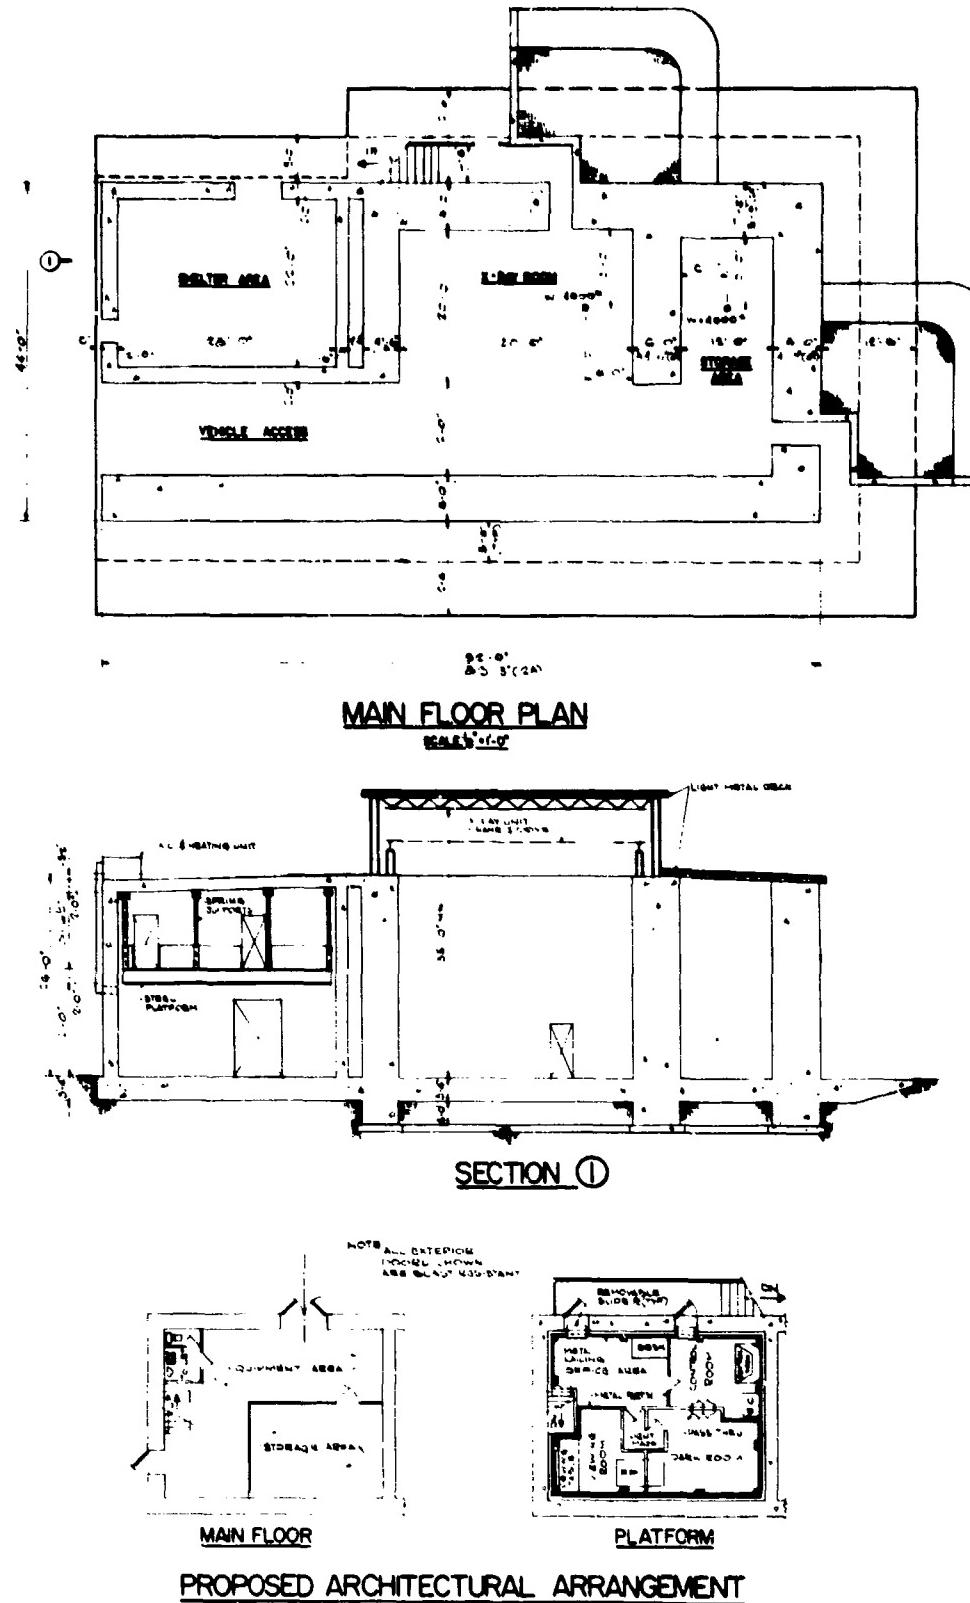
X-RAY BUILDING - SHELTER ARRANGEMENT No.2
